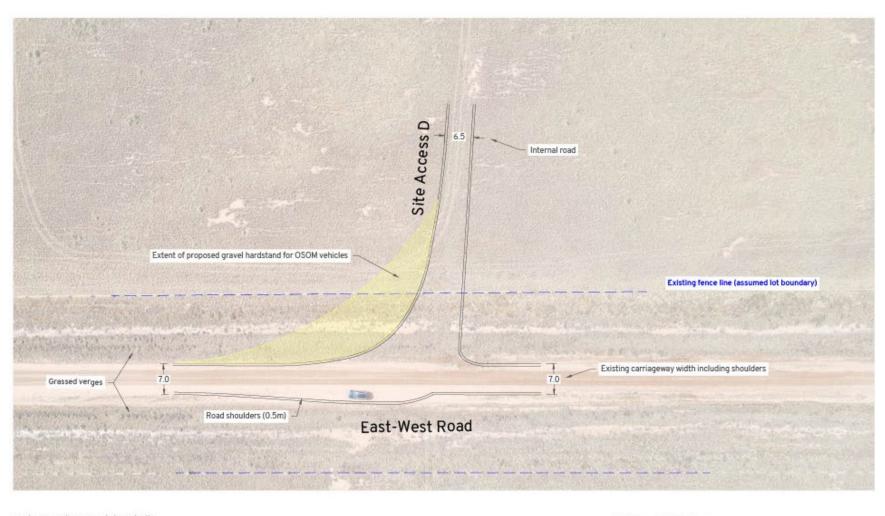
Intersection of East-West Road and Private Track (Site Entrance D)
